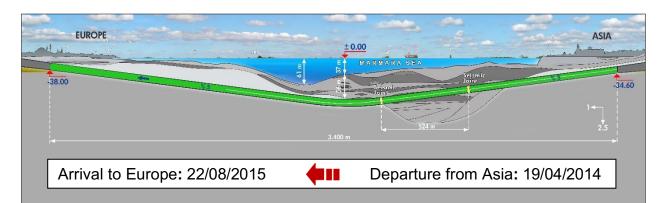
Eurasia Tunnel TBM Tunnel Route Profile
